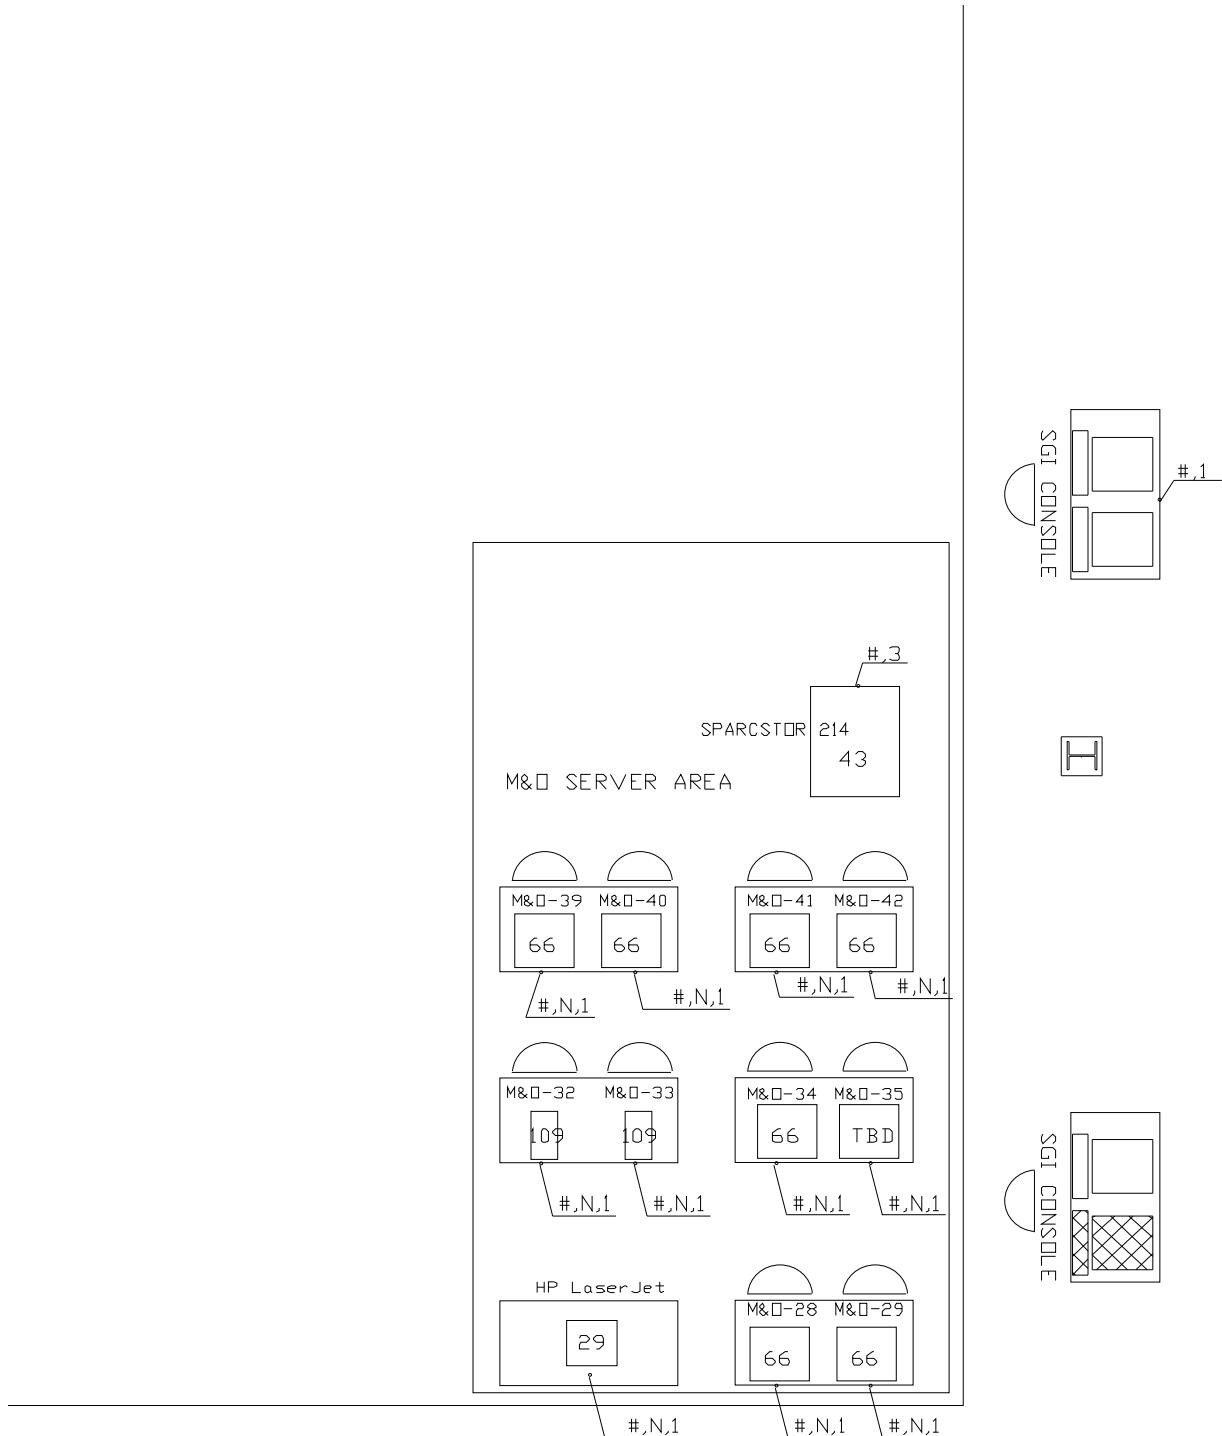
EDC Release B First Procurement -- Floor Plan for M & O Servers
